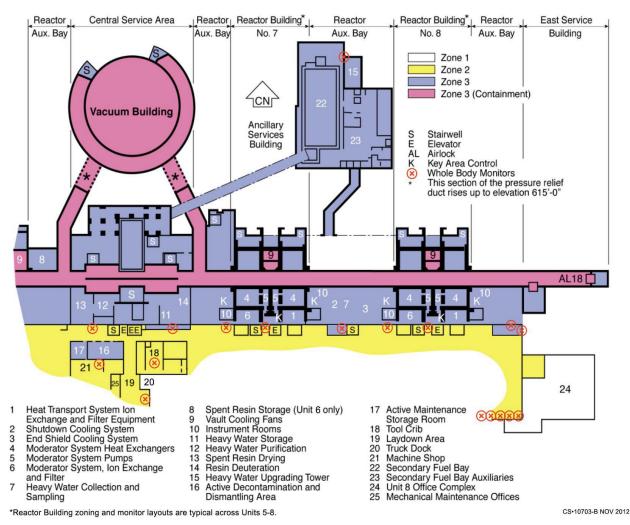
Plant zoning arrangement – floor plan at elevation 591 ft
